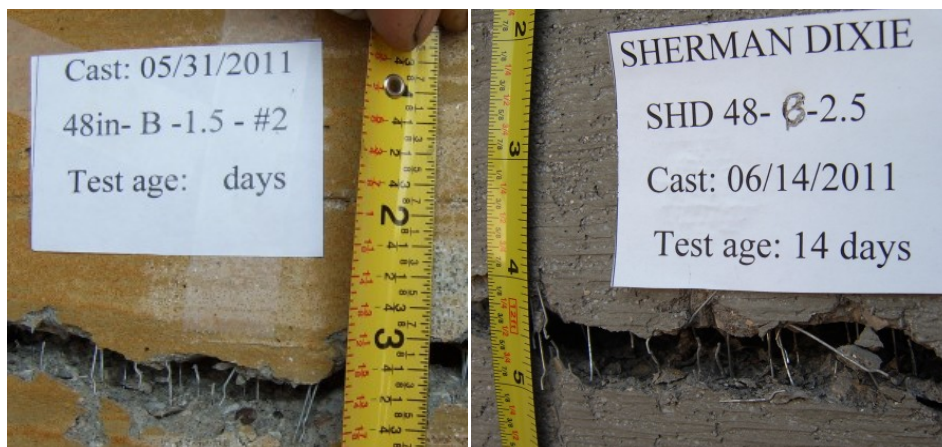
Typical crack opening for 48 in. (1200 mm) SFRCP at 5% deformation
